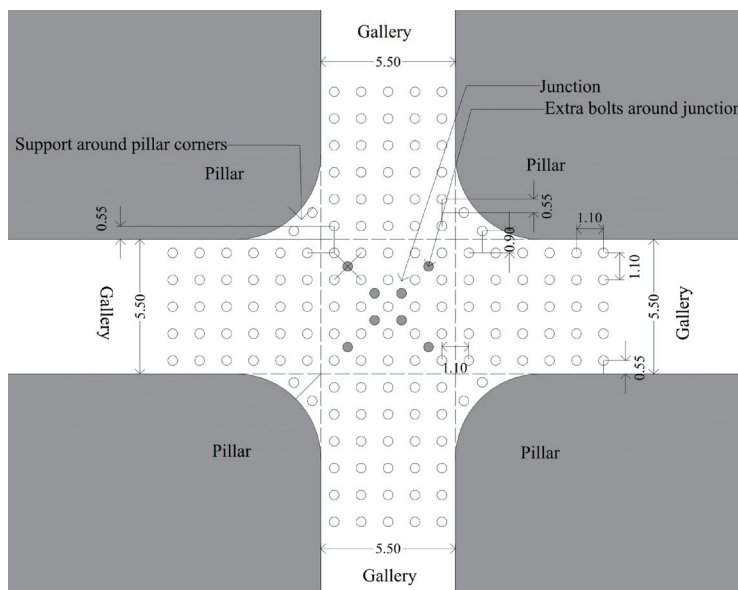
Proposed support plan in the 5.5 m widened gallery of the panel.
